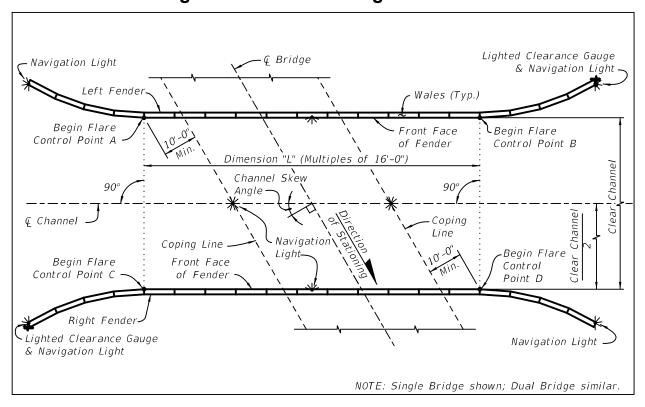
Schematic of Fender System Showing Treatment of Single or Dual Fixed Bridge with Skewed Channel
